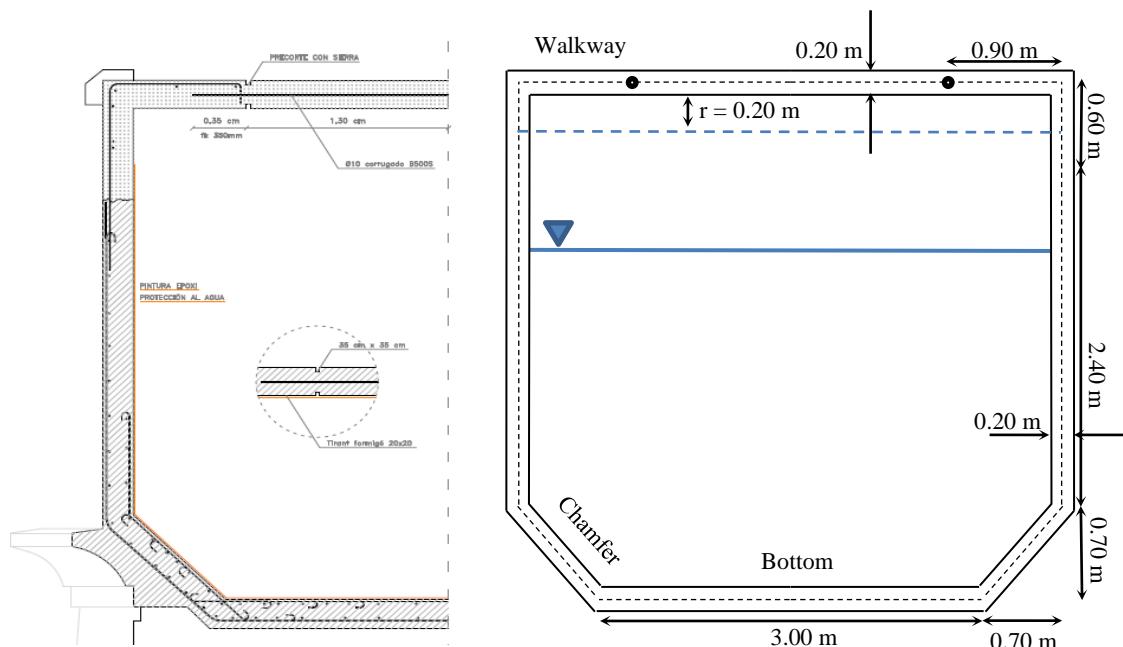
Geometry of the cross section of the canal and reinforcement configuration
